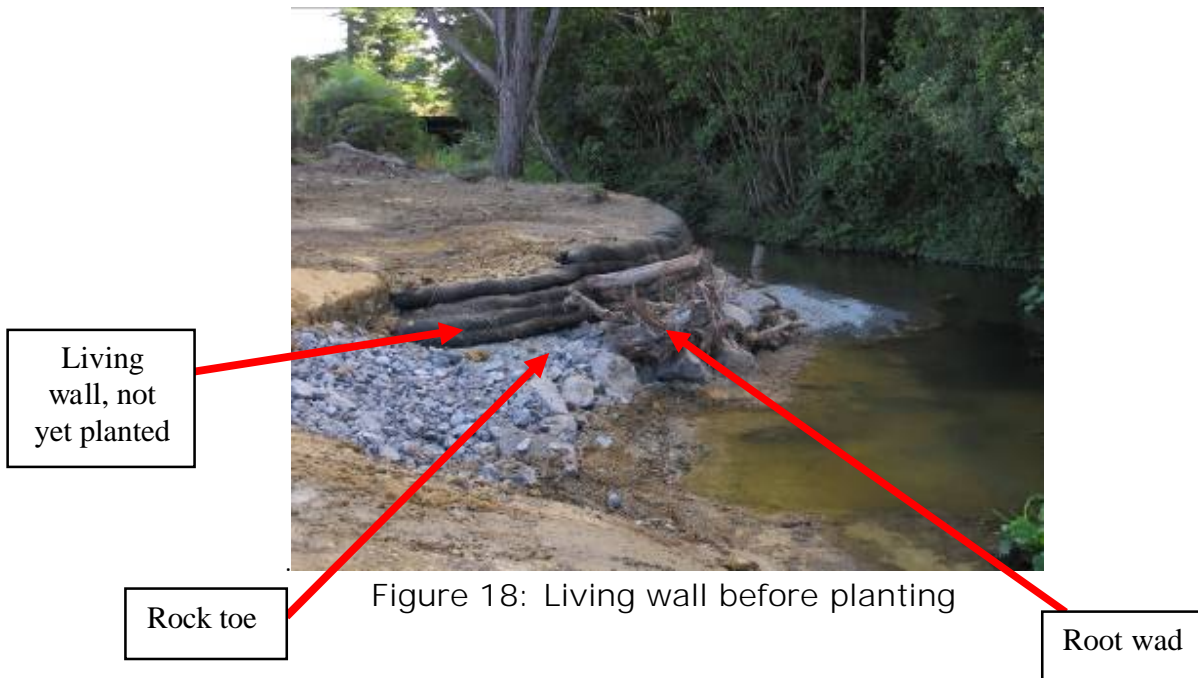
shows Root Wads which are tree roots with 3m to 5m section of trunk still attached that are pushed trunk first into the bank. They were used at the toe of the living walls to reduce the water velocity and provide in-stream habitat.
